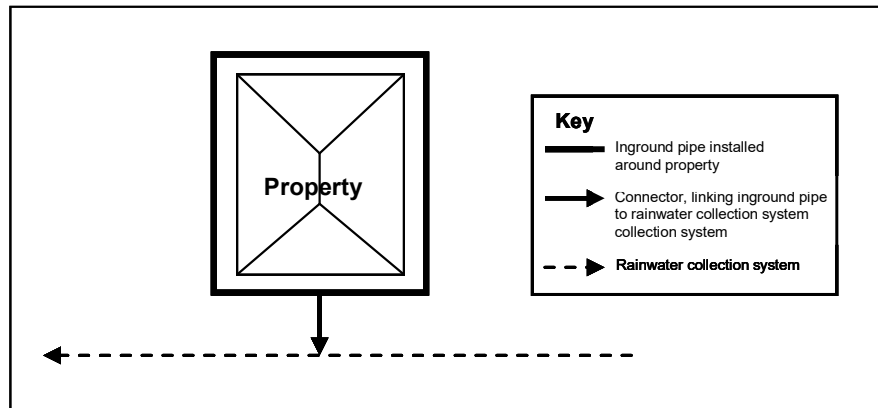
Schematic of in-ground pipe and connectors around a typical CDM household.
